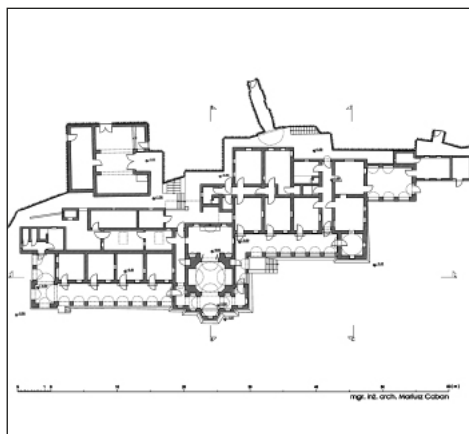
First detailed inventory plan of the building used as an archaeological dig-house (Plan M. Caban)
